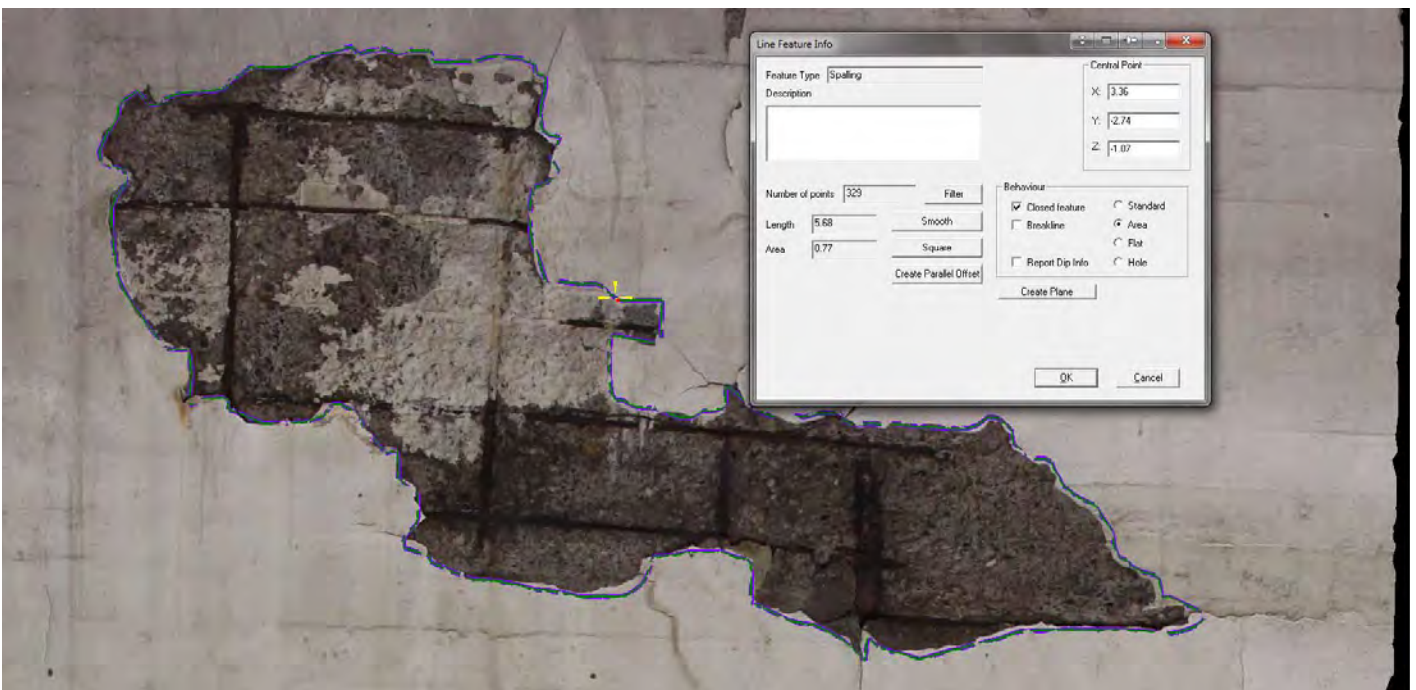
Typical survey of spalling event in a final lining.
